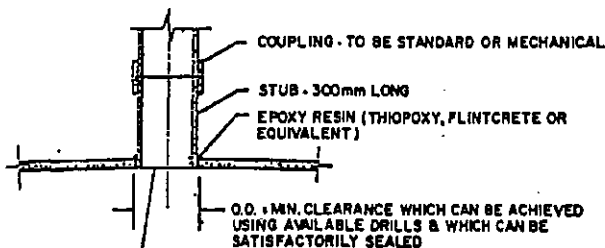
DETAIL OF LATERAL CONNECTION TO CONCRETE TRUNK
